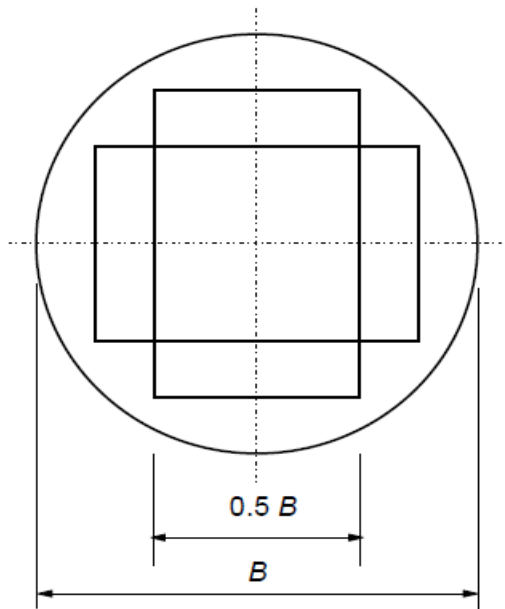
Orthogonal reinforcement in circular spread footing on soil
